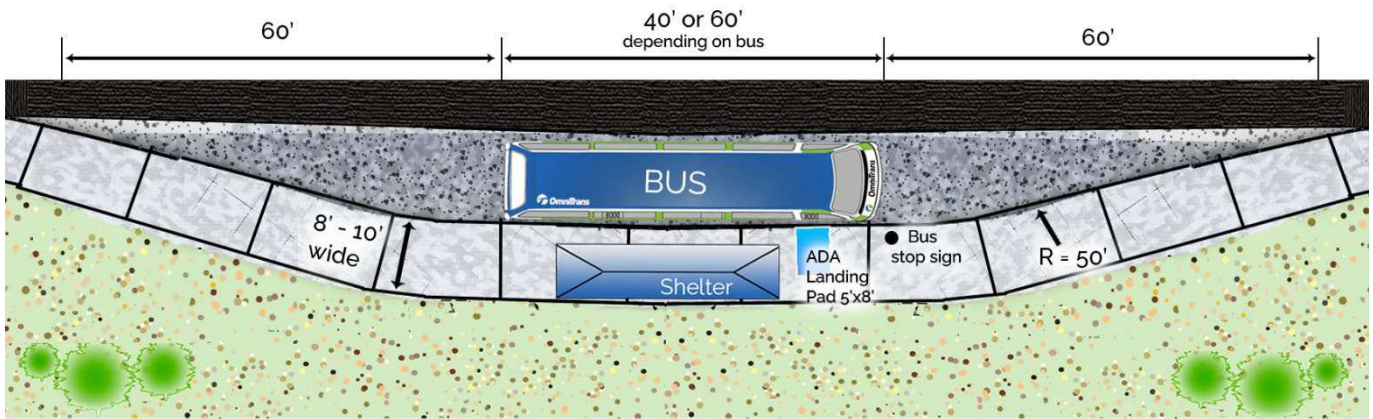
Turnout design where not immediately at an intersection (60' spacing).
